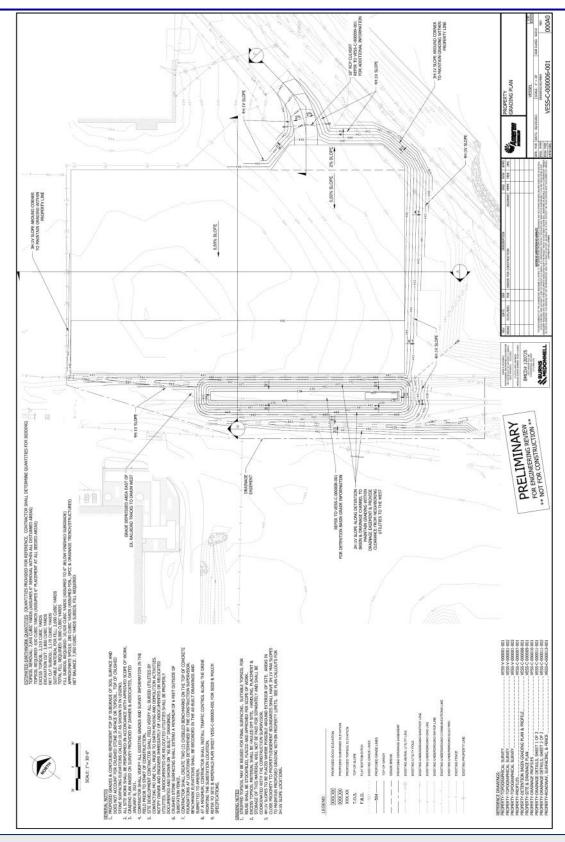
EXHIBIT B: CIVIL PLANS, 2 (GRADING PLAN)
